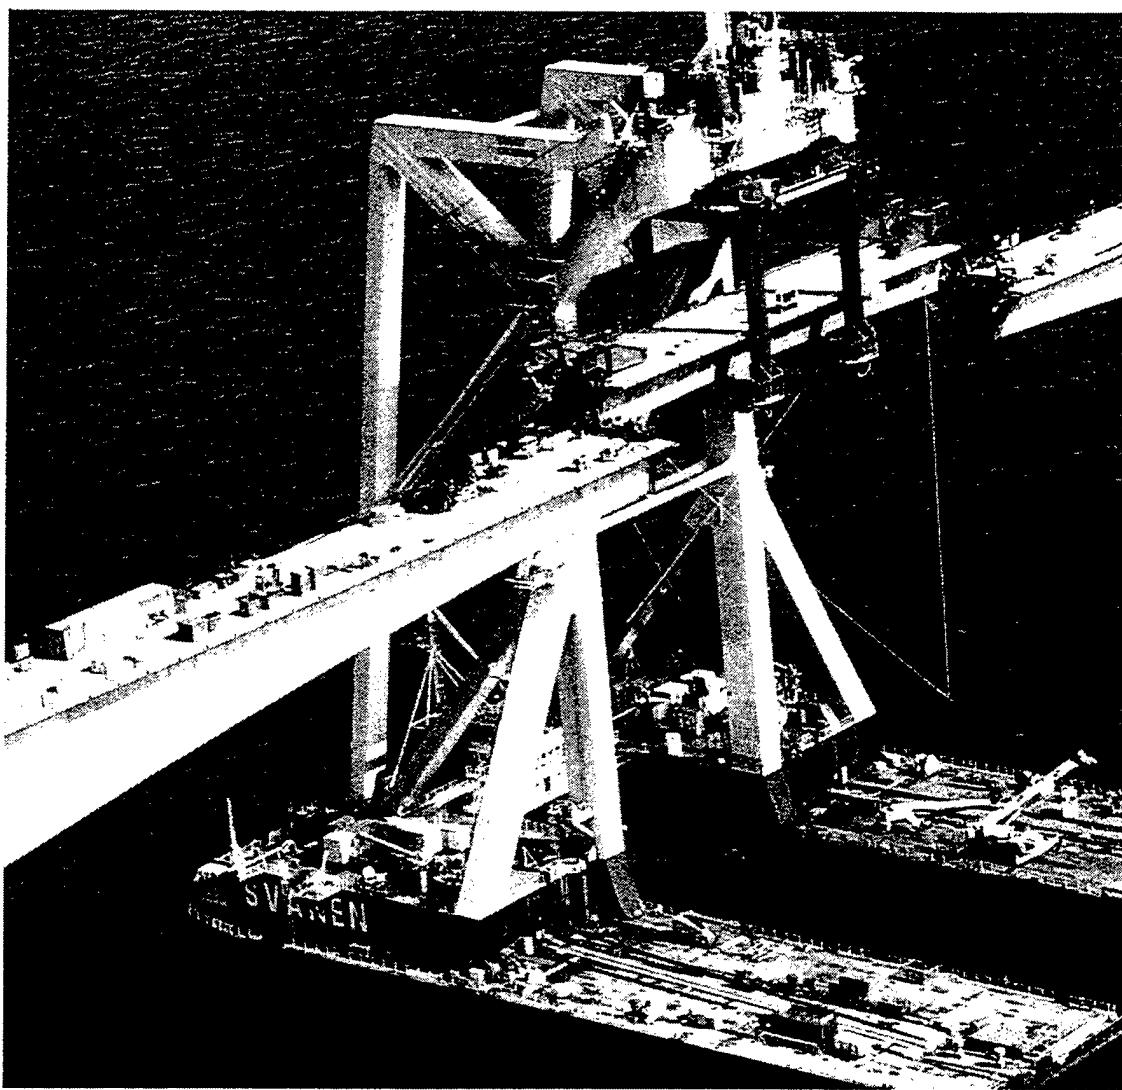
Placing the Last Drop-in Girder on November 19, 1996
